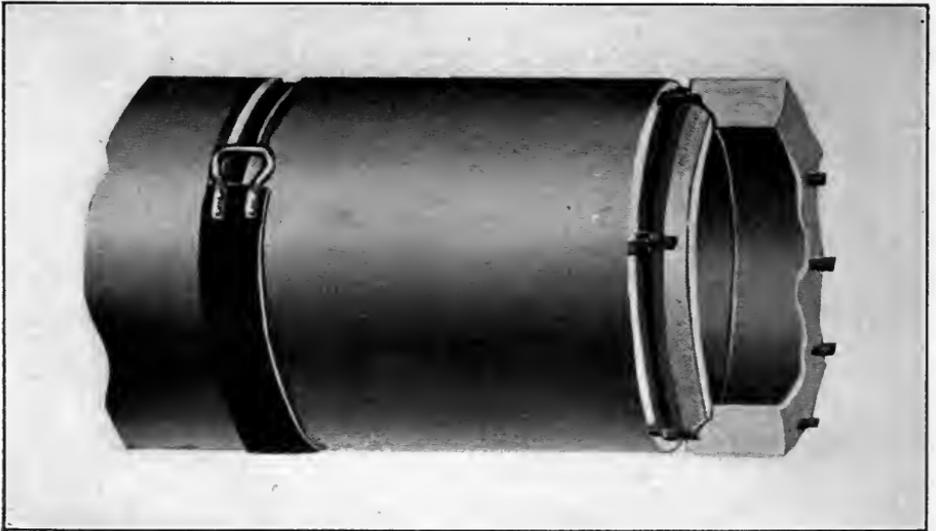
FIG. D.—Method of making lock joint. Reinforced Concrete Pipe Co., Los Angeles, Calif.
